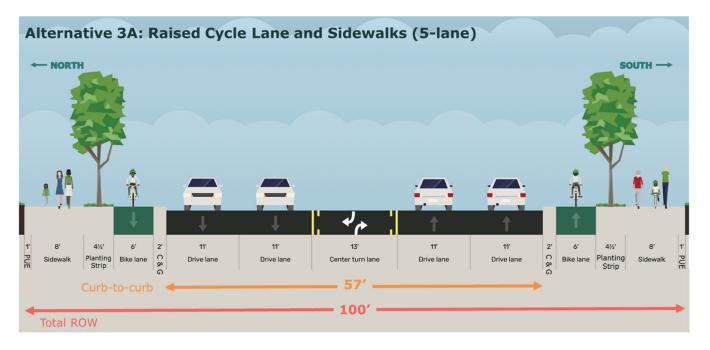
FARMINGTON ROAD CORRIDOR - ALTERNATIVE 3A: CROSS-SECTION WITH RAISED CYCLE LANE AND SIDEWALKS (BLTS= 1, PLTS= 2)
